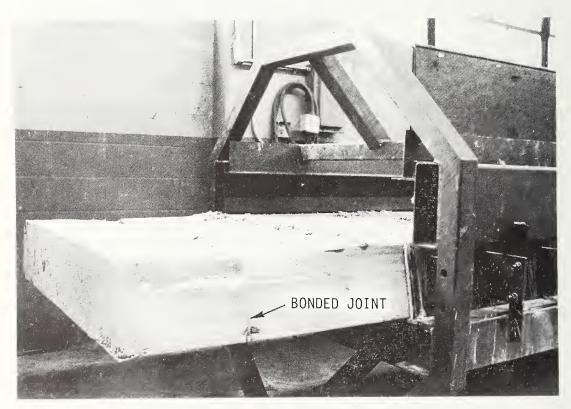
BOND BETWEEN TWO CONCRETE PLACEMENTS
